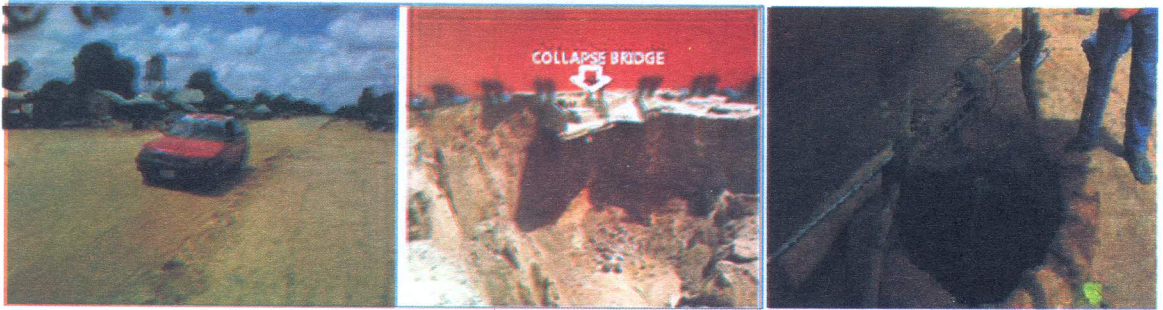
Eroded road and bridge with collapse well at Rafingora village.
